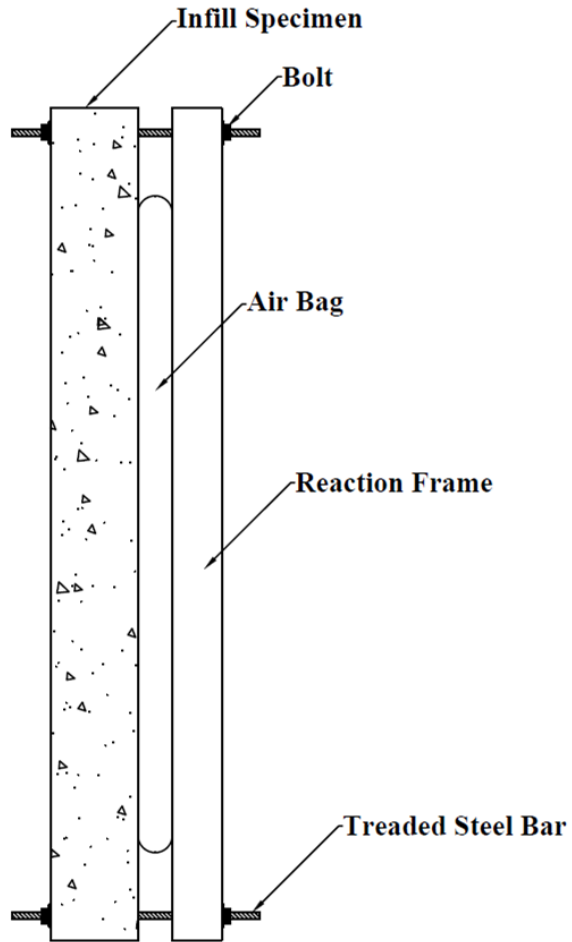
Schematic Top View of the Air Bag Loading Arrangement
